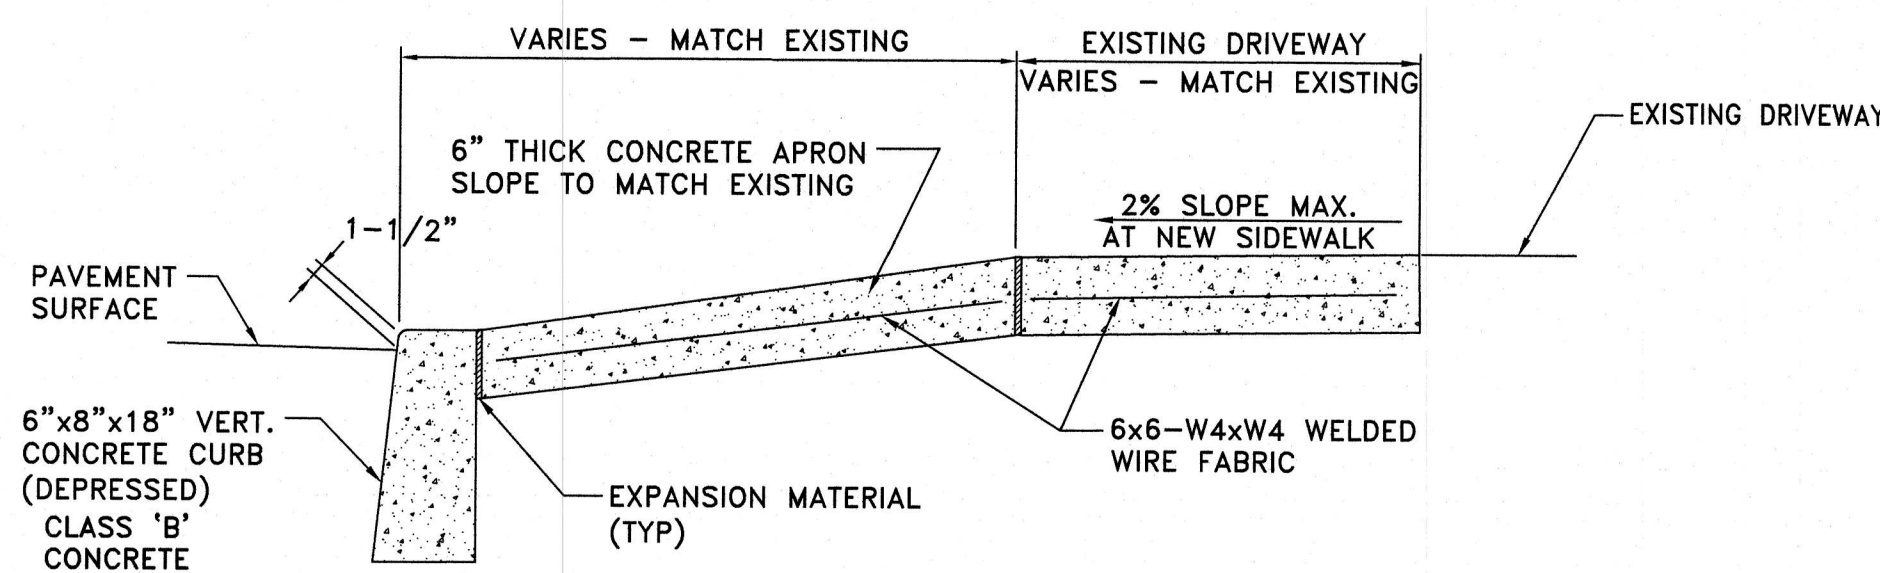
6"X8"X18" VERTICAL CONCRETE CURB RESTORATION
